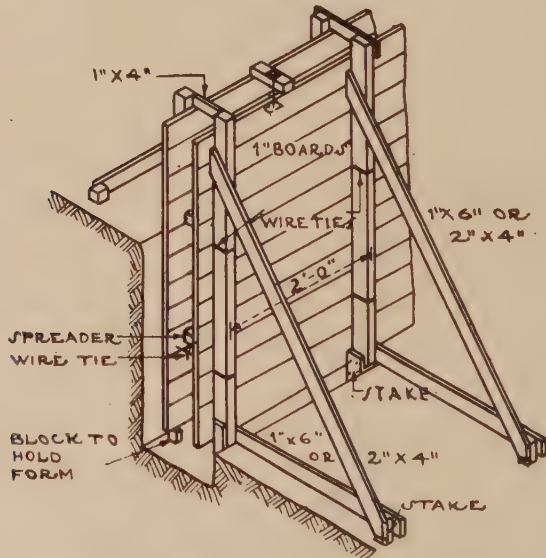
Form for foundation and cellar wall located in ground which is not firm.
